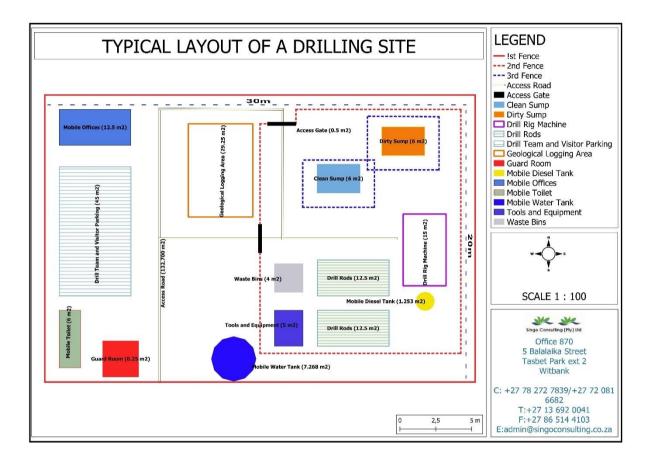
Typical layout plan of a drilling site. [Singo consulting,2023]
